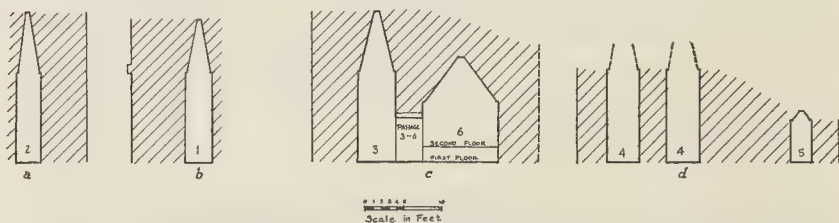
Sections of rooms, Group I: a, Building A, Room 2; b, Building B, Room 1; c, Building B, Rooms 3 and 6; d, Building B, Rooms 4 and 5
